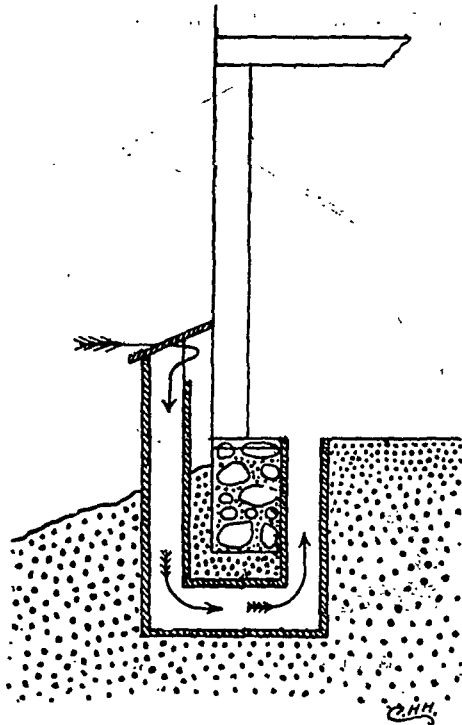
SECTION OF WALL SHOWING FORM OF INLET USED AT THE EXPERIMENTAL FARM.
